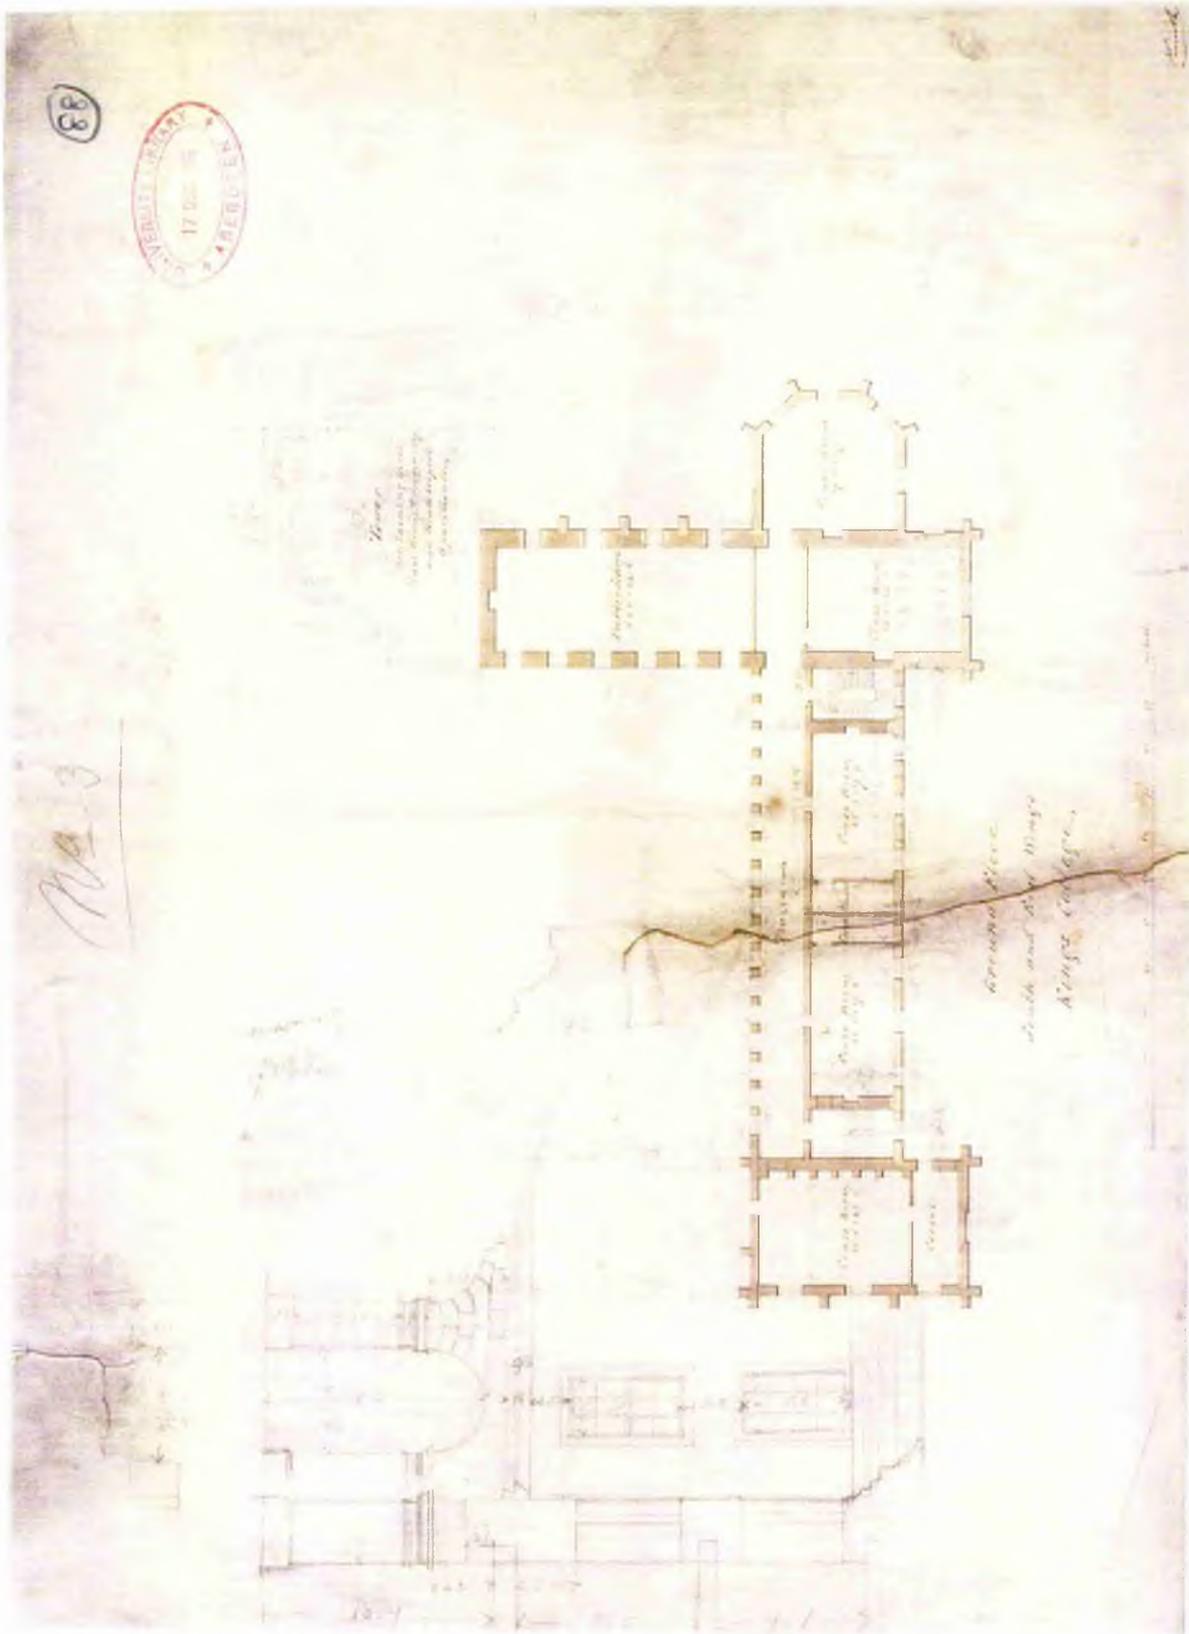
King's College. Ground floor plan. J. Smith, 1822.
